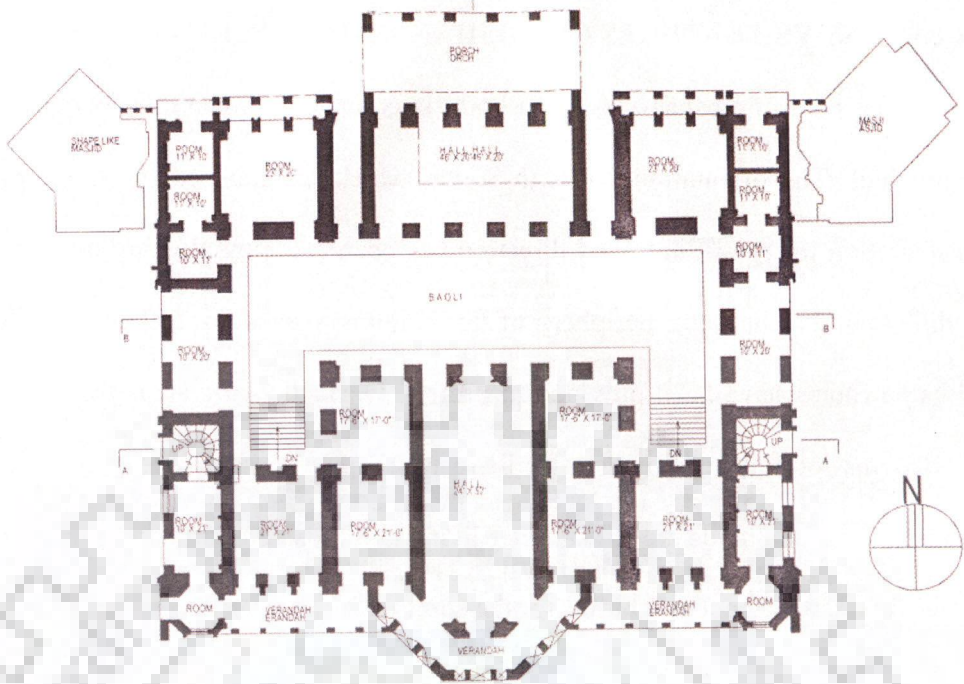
Ground Floor Plan of Roshan ud Daula Kothi
